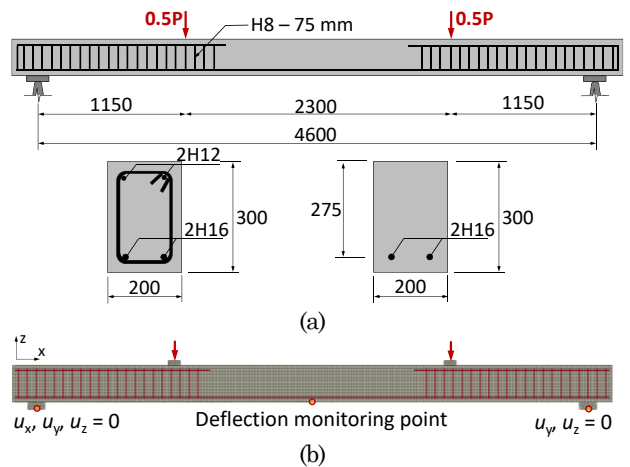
(a) Elevation and Cross-section Details of Monfardini and Minelli (MM) Beams [14]; (b) Typical Finite Element (FE) Mesh used in the Analysis. All dimensions in mm.
